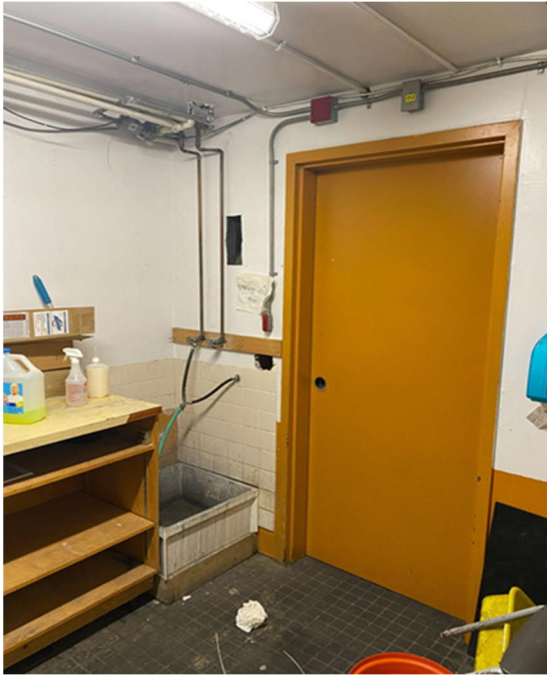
Mechanical Room Door - No Hardware Duct Penetration in Wall - No Damper
